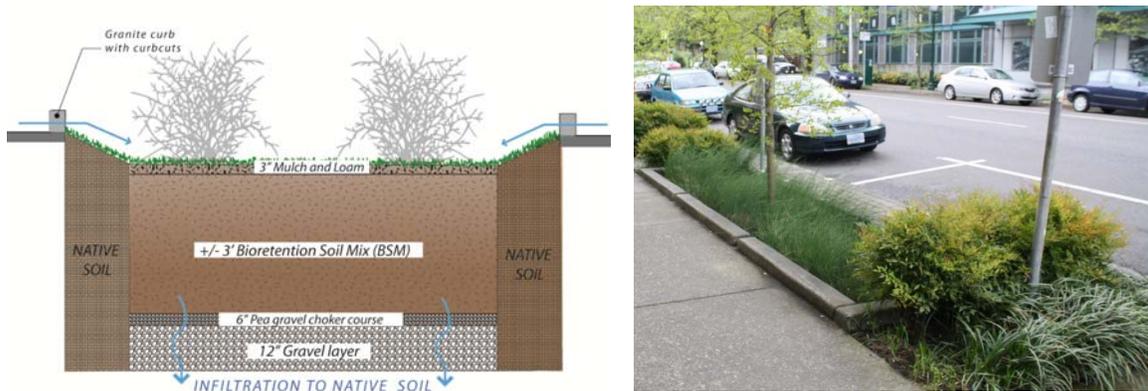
TYPICAL INFILTRATION PLANTERS
